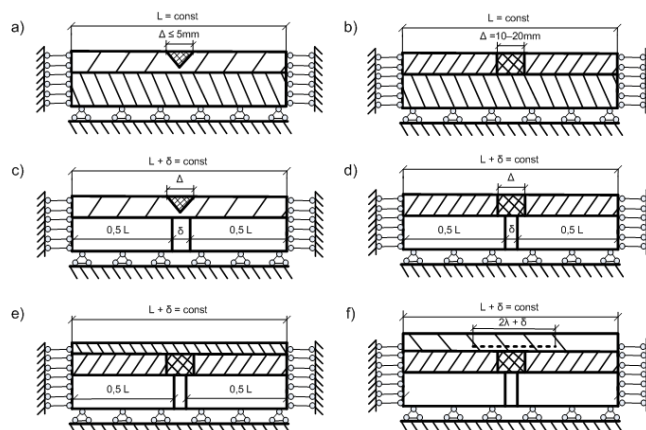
Design models for the calculation of stresses in asphalt concrete pavement after repairing activities:
